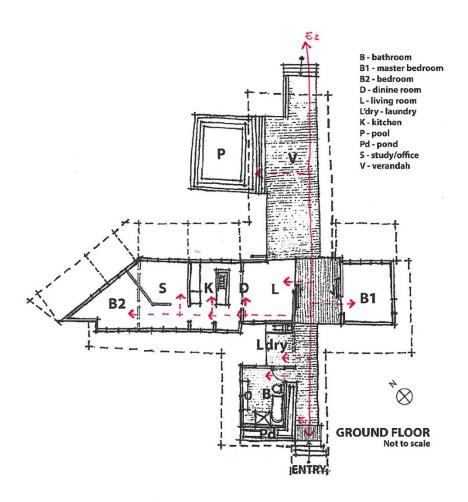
Concentration of one long breezeway also used as verandah is an innovative concept of the Mortlock Residence. Reproduction of the floor plan by the author.
